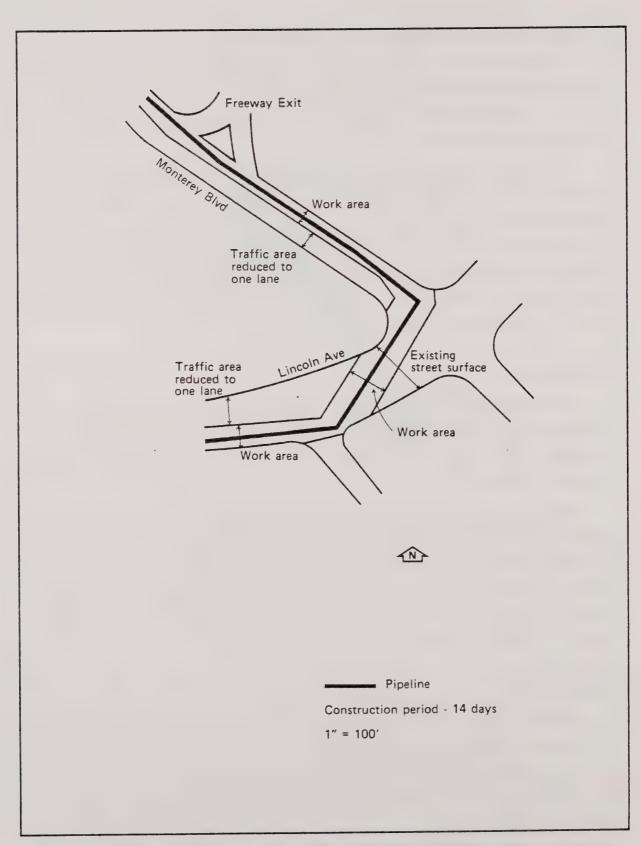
PIPELINE ALIGNMENT—MONTEREY BOULEVARD/LINCOLN AVENUE INTERSECTION
